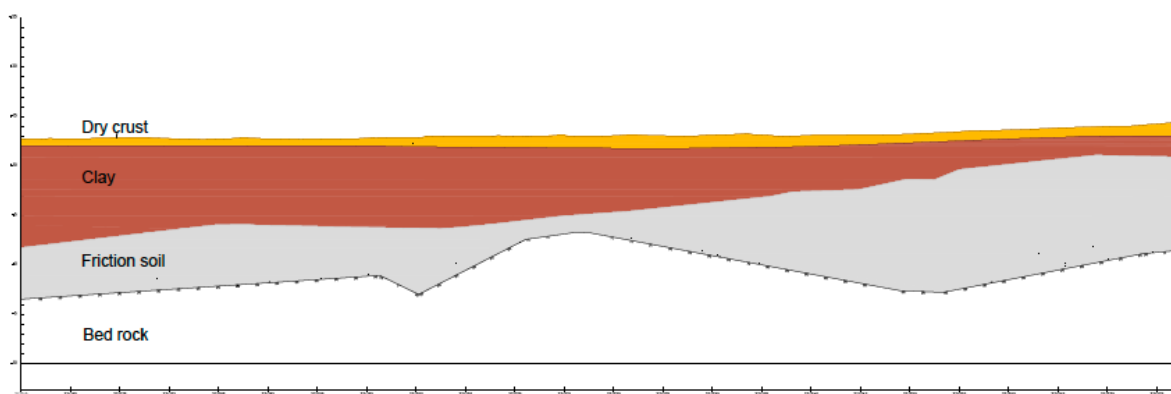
Soil profile of the site LCC to be installed (Trafikverket)
